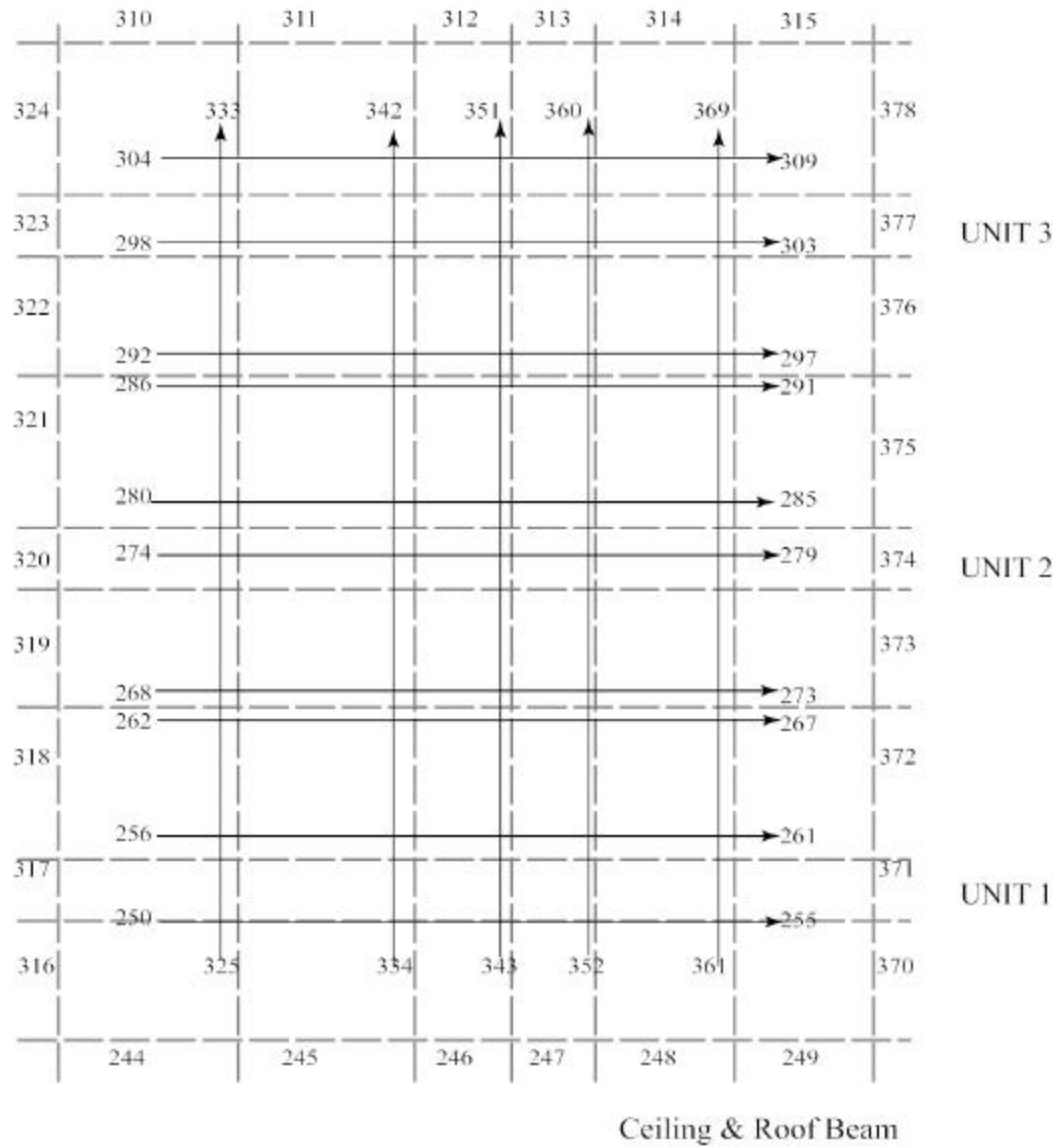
Locations, Orientation and Numbering of Frame Elements for the Roof of the Townhouse Index Building.
